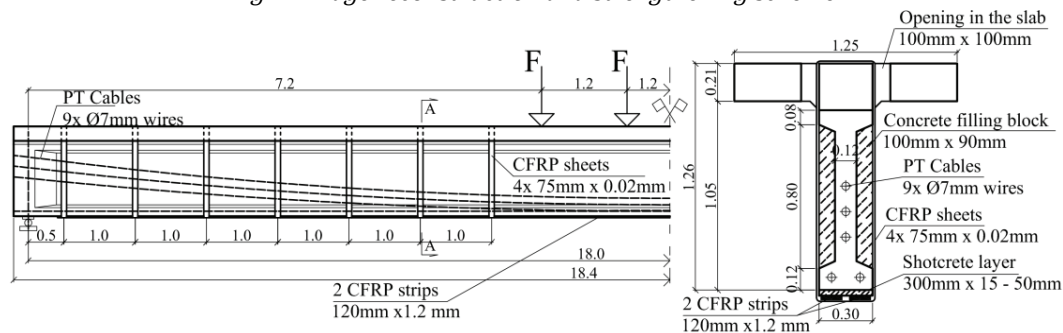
Strengthening and testing scheme of the laboratory girders.
